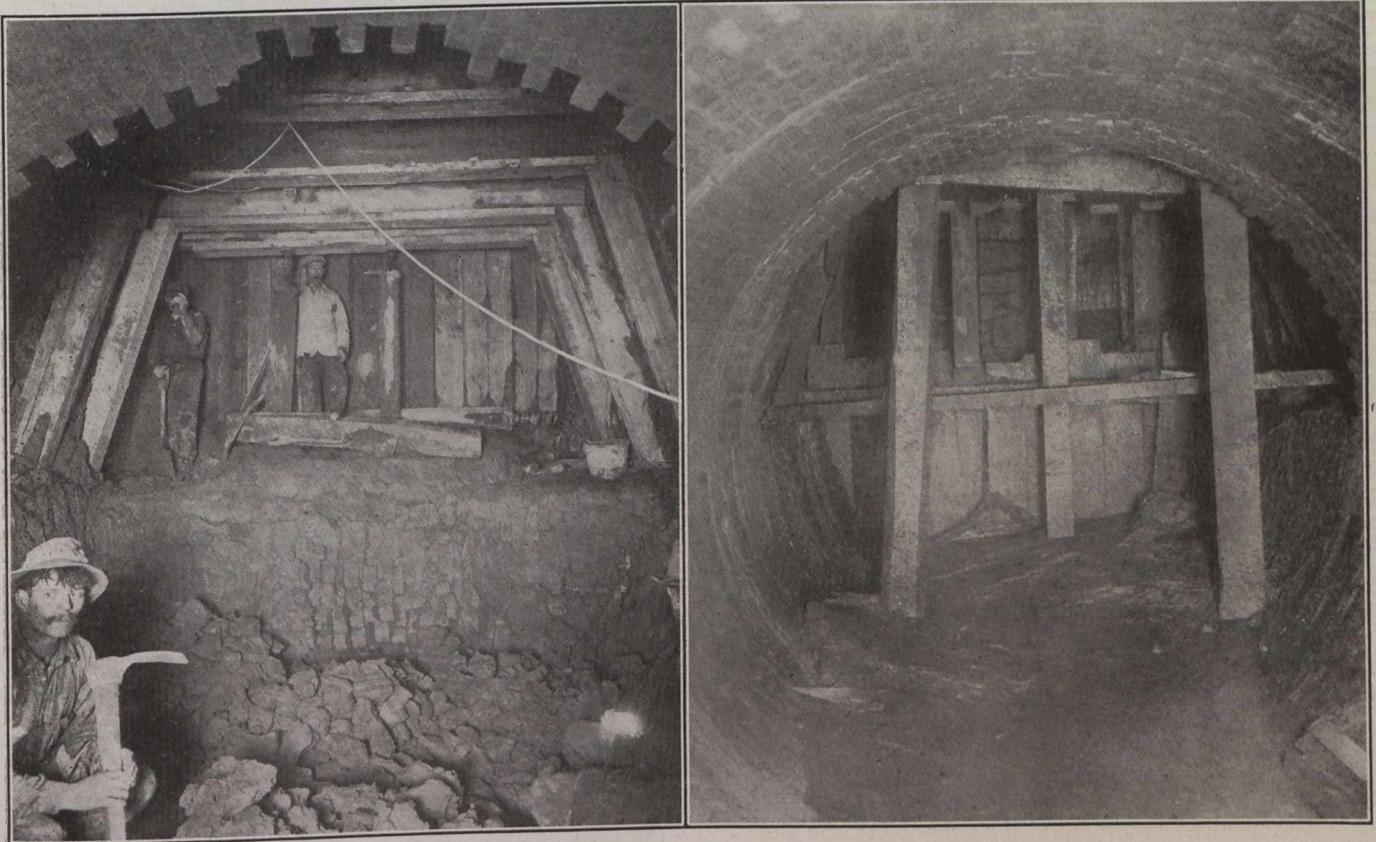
Tunnel Headings 80 Feet Apart in the Keele Street Sewer Work, Toronto. One View Shows Good Working Clay and the Other a Heavy Water Seepage Requiring 12 to 18 lbs. of Compressed Air.
